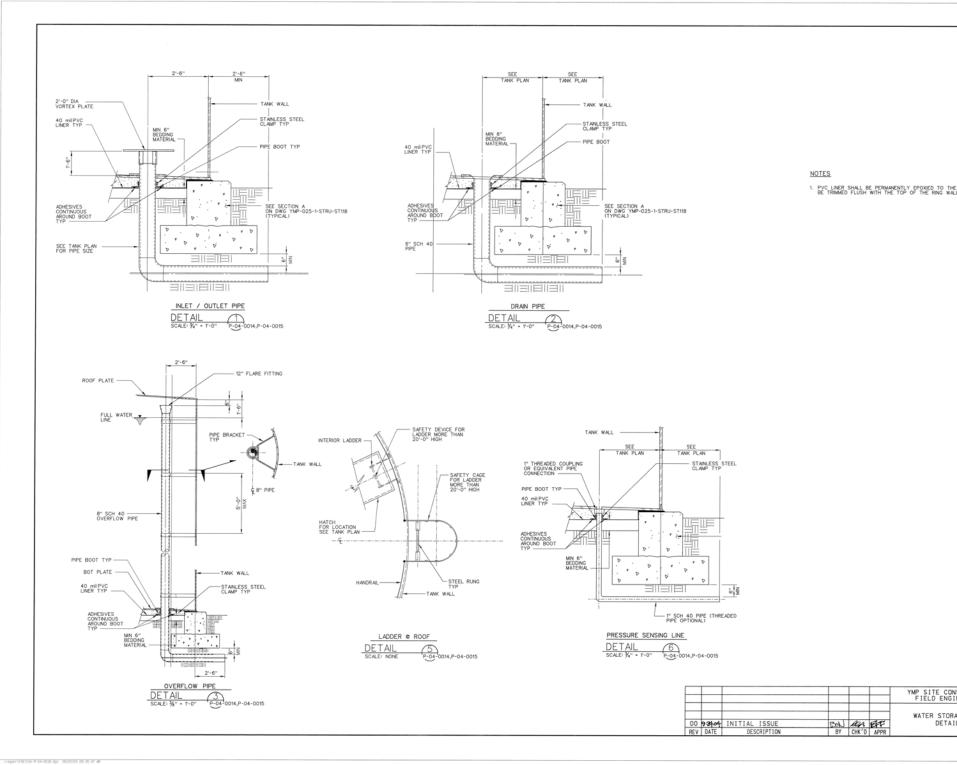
Booster Pump Station Water Tanks Plan and Sections
